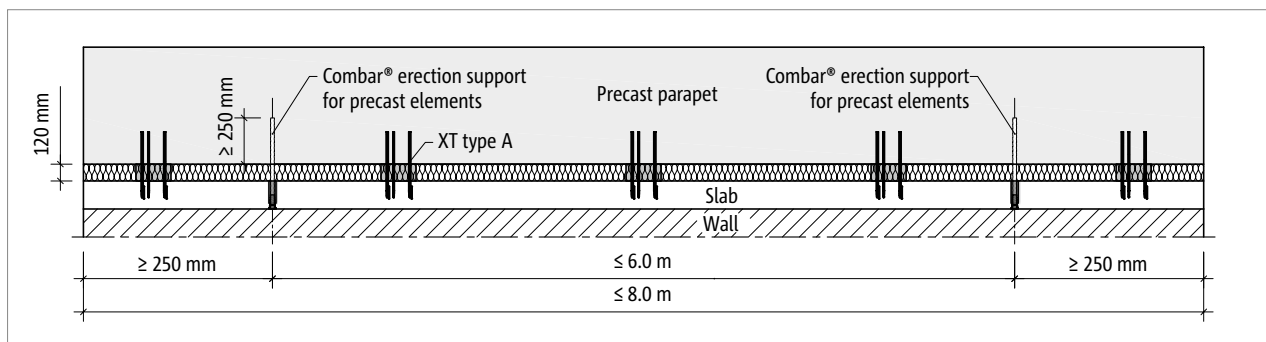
Schöck Isokorb® XT type A with Combar® erection support for precast elements: Edge distance and minimum bond length in the prefabricated parapet
